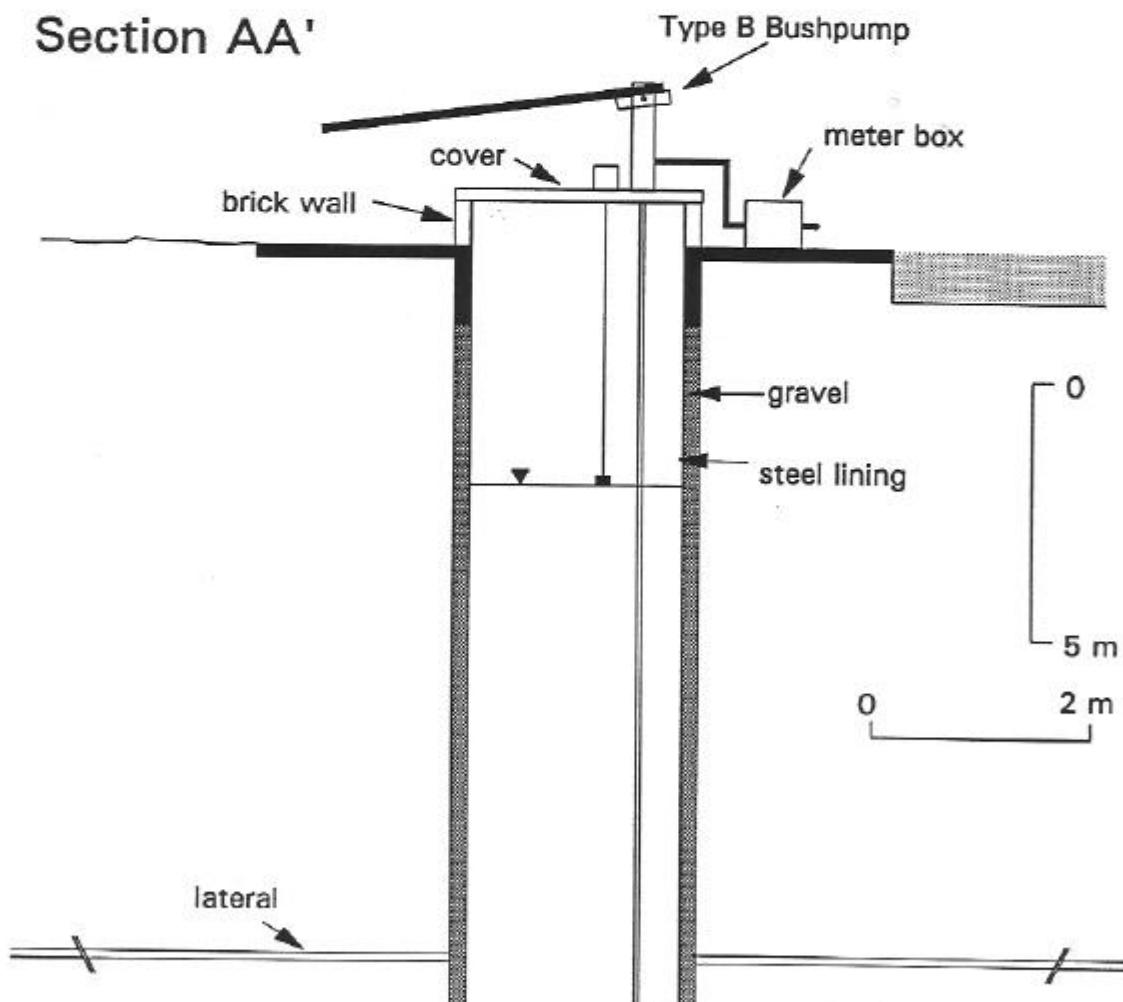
Collector well and headworks construction, site 4, Nemauka
